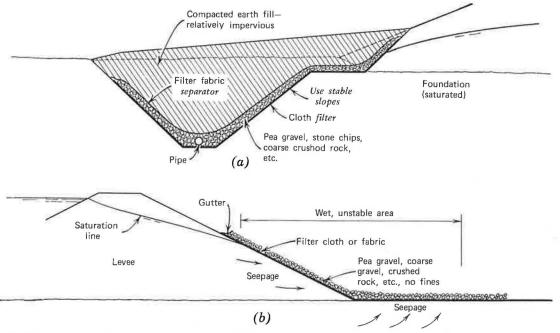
Illustration of two potential uses for fabrics in drains for dams and levees. (a) A toe drain controlling seepage through dam and foundation, (b) A temporary measure for preventing imminent failure. (After Fig. 5.16 of "Seepage, Drainage, and Flow Nets," 2nd Ed., H. R. Cedergren, Copyright © 1977, John Wiley & Sons, Inc. N. Y. Reprinted by permission of John Wiley & Sons, Inc.)
